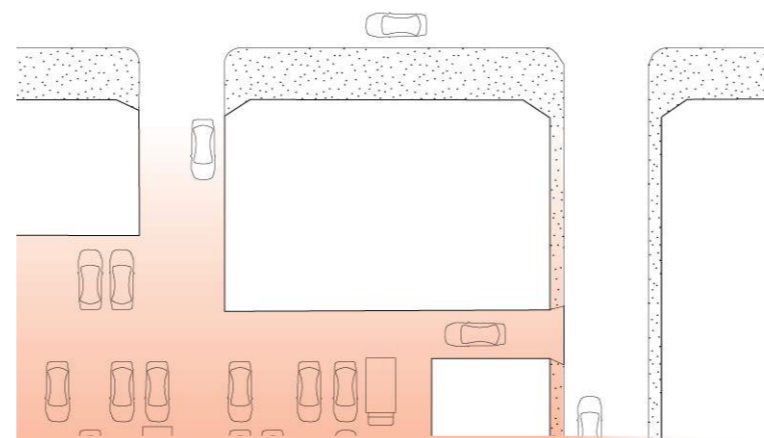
Locating larger car parking lots between the street and the building may reduce street amenity and compromise pedestrian access to buildings.
